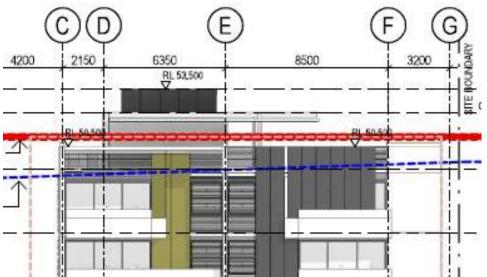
Northern tower, southern elevation with blue line indicating the 44m Height of Building development standard (supplied by applicant)
